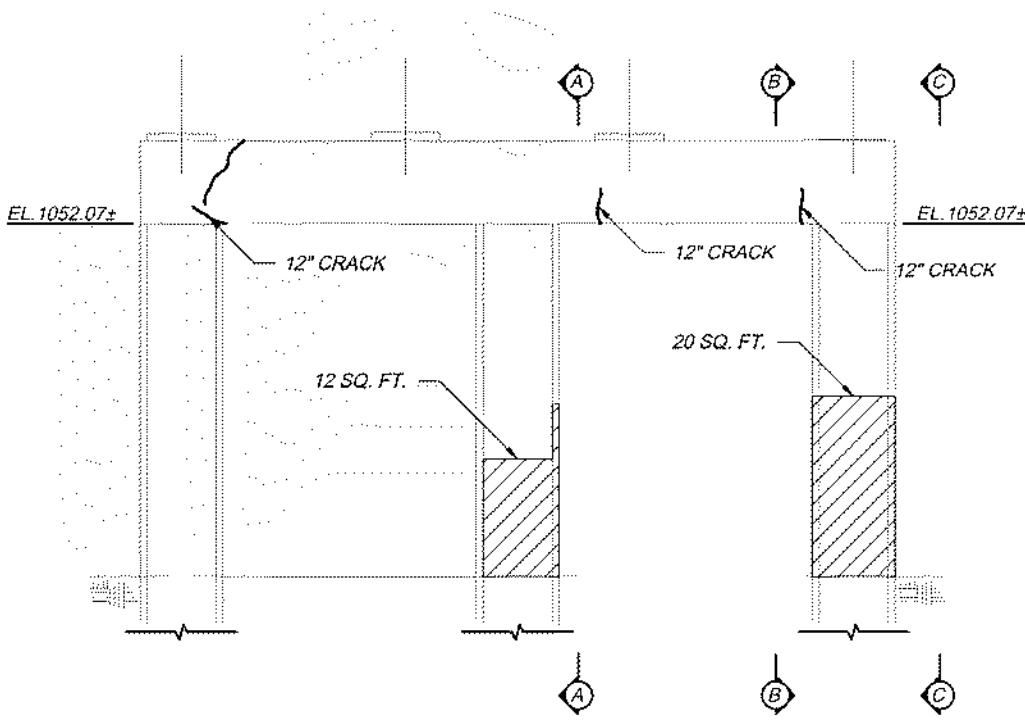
Location of Proposed Concrete Repairs - Pier 3 Downstation (North) Face Elevation MP 182.1
